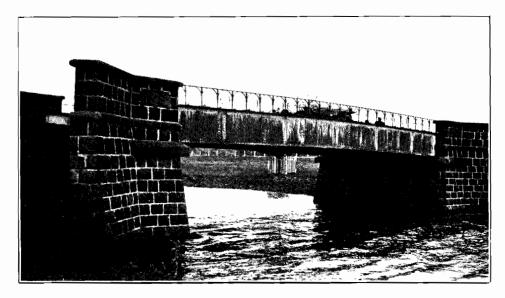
Portland Shire. Showing bridge near Hotspur; erected 1870.
